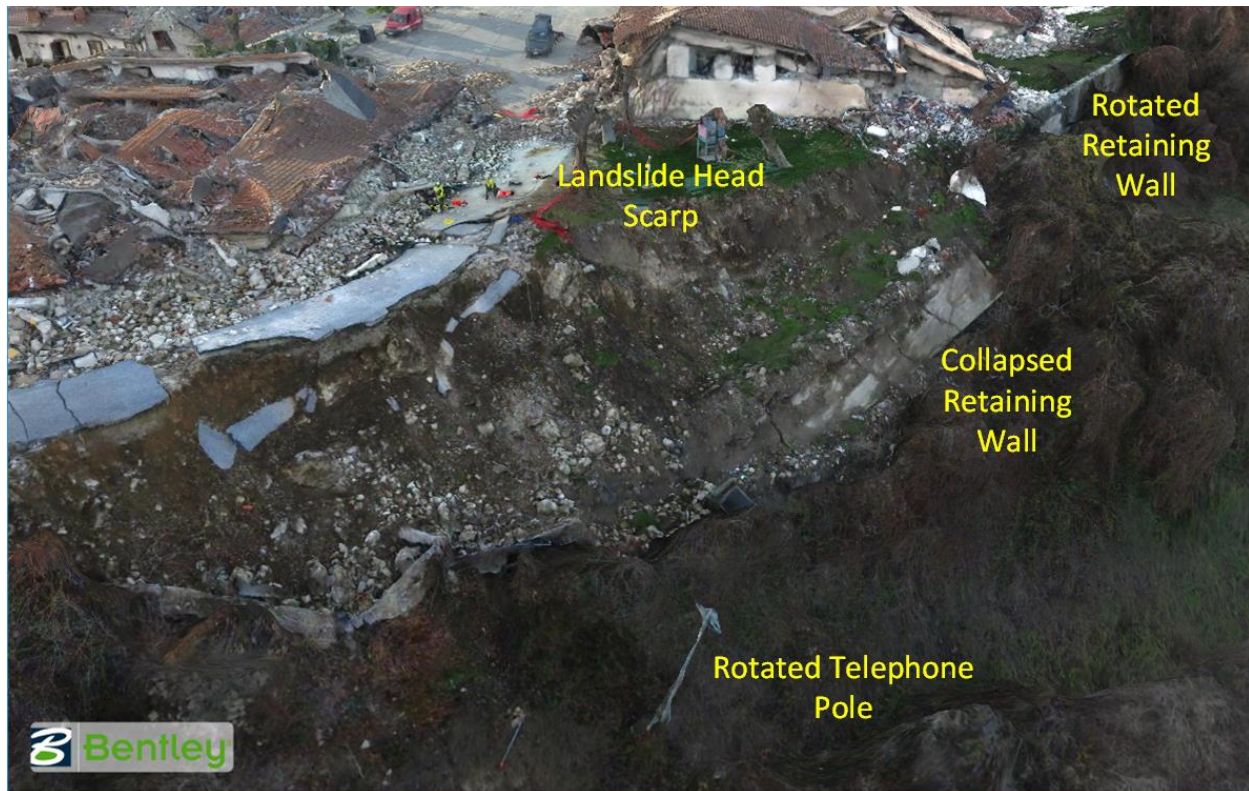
3D model screenshot identifying objects of interest with the failed retaining wall and shallow slope failure at Point 4a.
